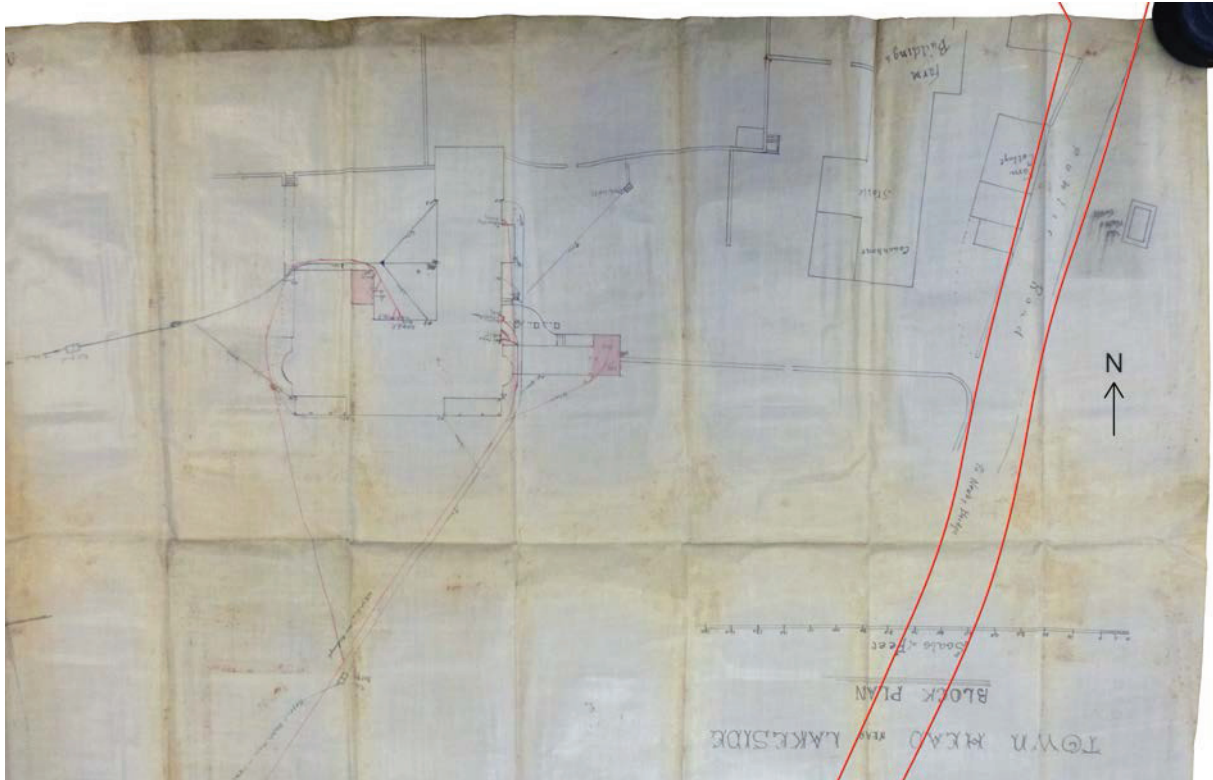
Block plan of the proposed new privy and ash pit, 1896
